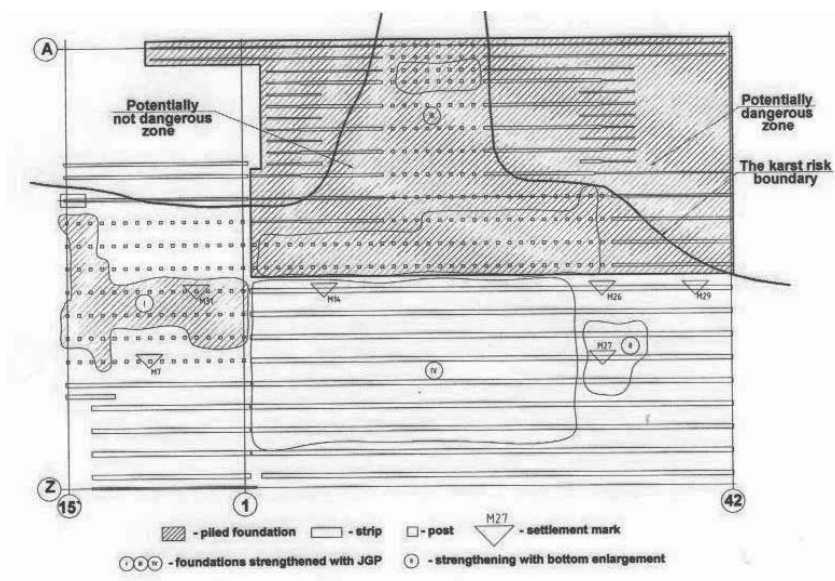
Combined plan of foundations, strengthening constructions and settlement marks
